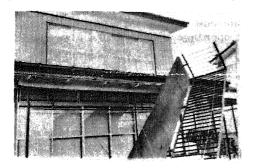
A steel balcony tumbled off the upstairs. It had been screwed only to the wall upstairs.
